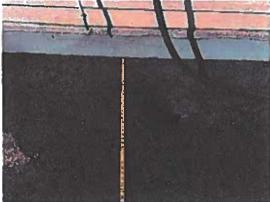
Sinkhole in the asphalt deck, corresponding with voiding in the quaywall below at STA 1+25.
